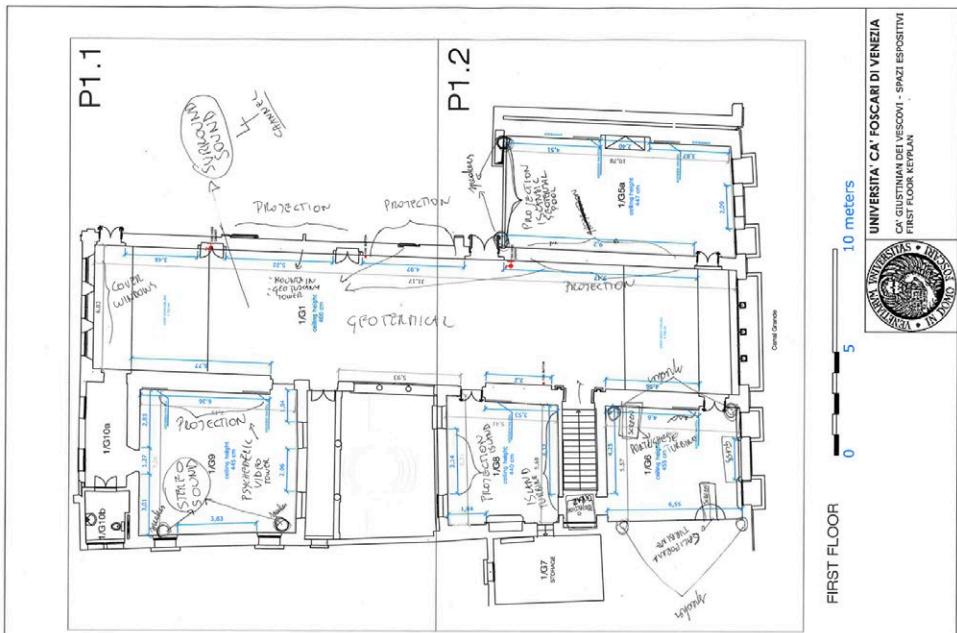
© Bill Fontana, Installation plan for *Primal sonic visions* (First floor of Ca' Foscari Exhibition space).
